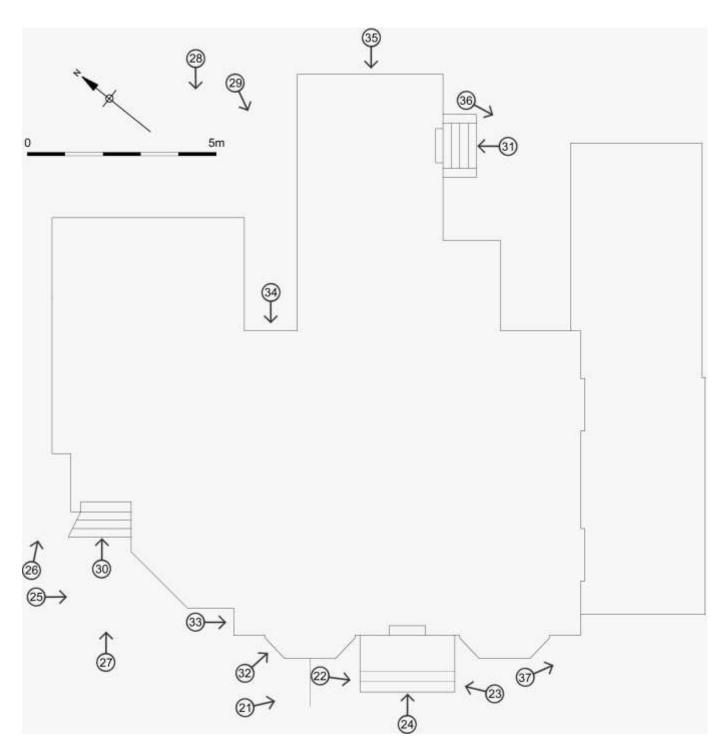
Outline plan of the building showing location and direction of detailed external views (Figs.21-37)
